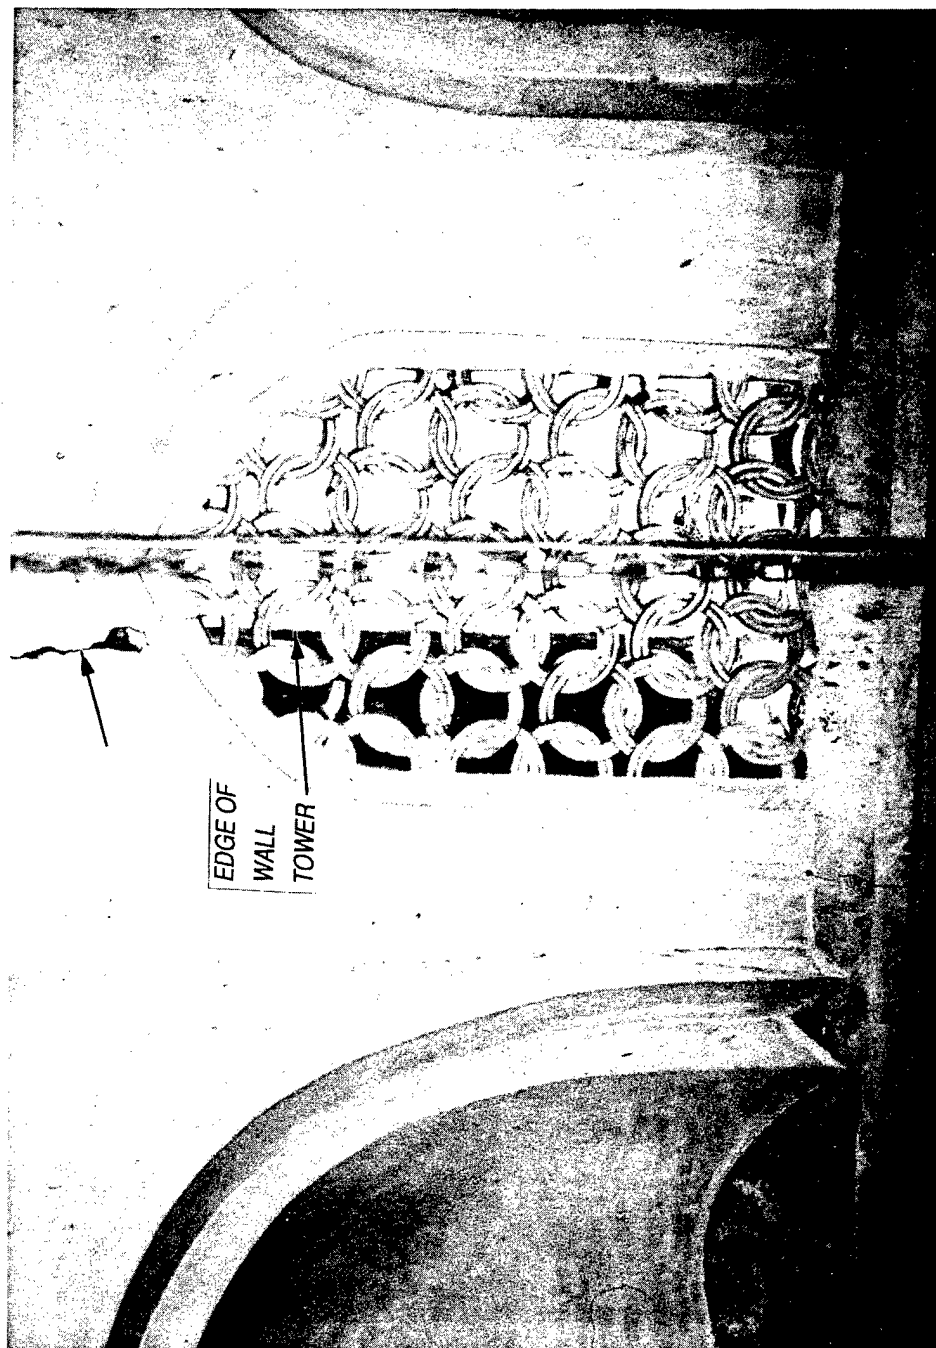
Base of dome at eastern corner of al-Hakim Bi-Amrillah Mosque showing crack extending up from window corresponding to wall tower
